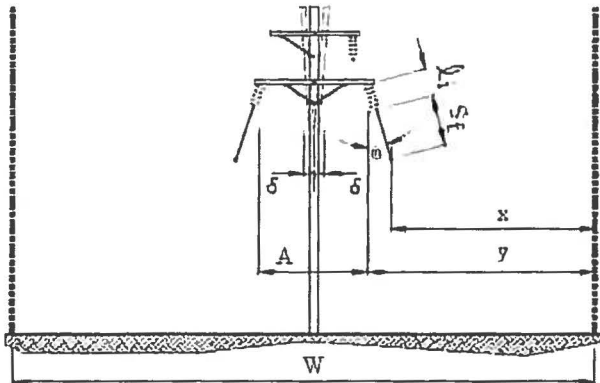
ROW WIDTH FOR SINGLE LINE OF STRUCTURES
